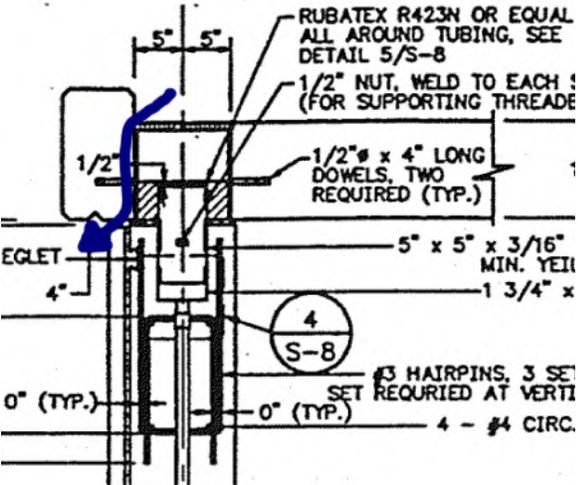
Whatcom Falls 2 – Blocked Drain and Core Demo'ed Parapet to Facilitate Drainage.
